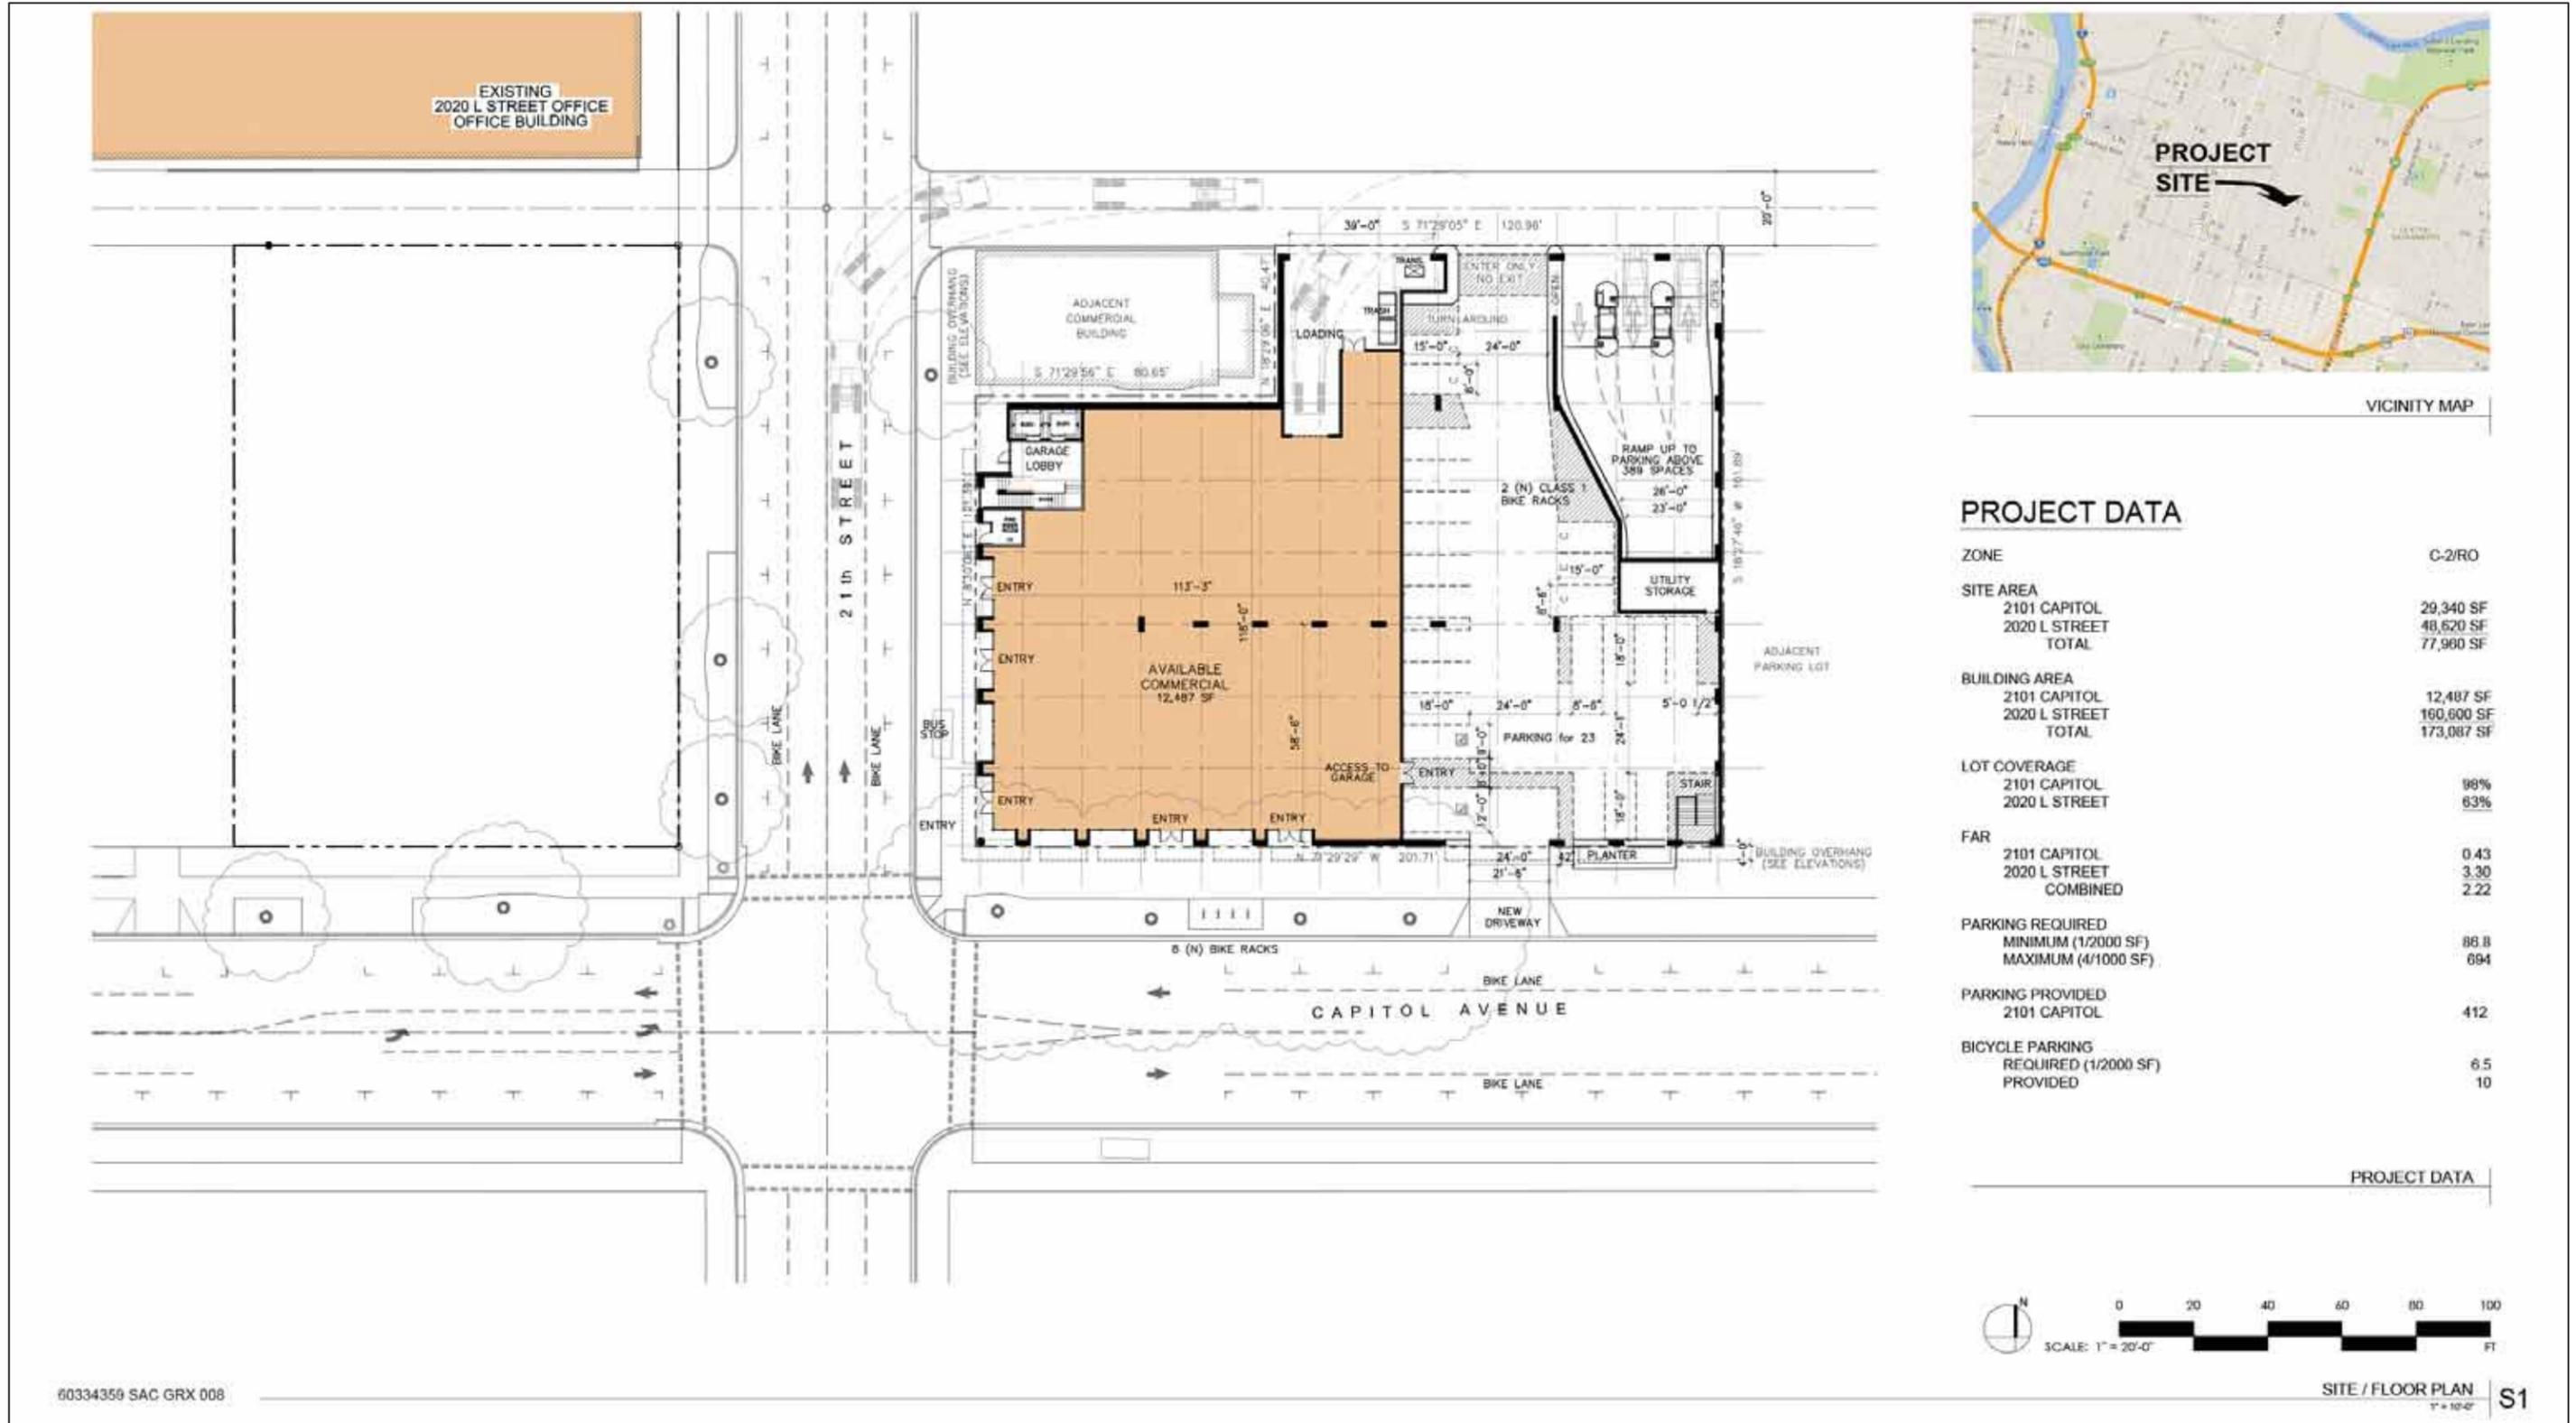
2101 Capitol Avenue Site Plan
